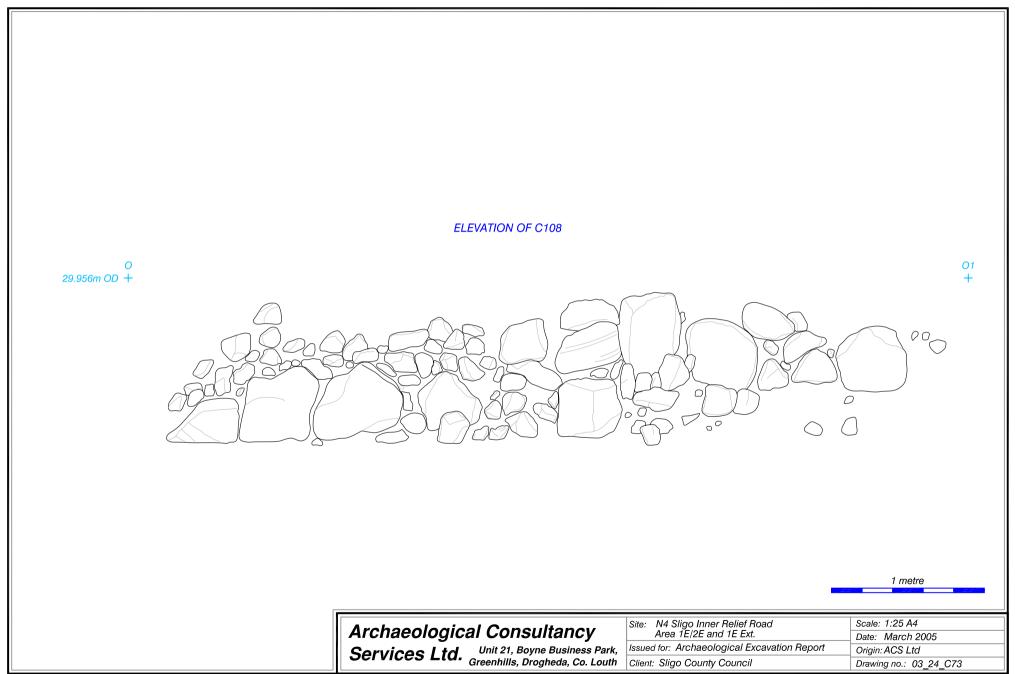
Elevation of C108(surviving retaining wall). For location of elevation see Fig. 12
